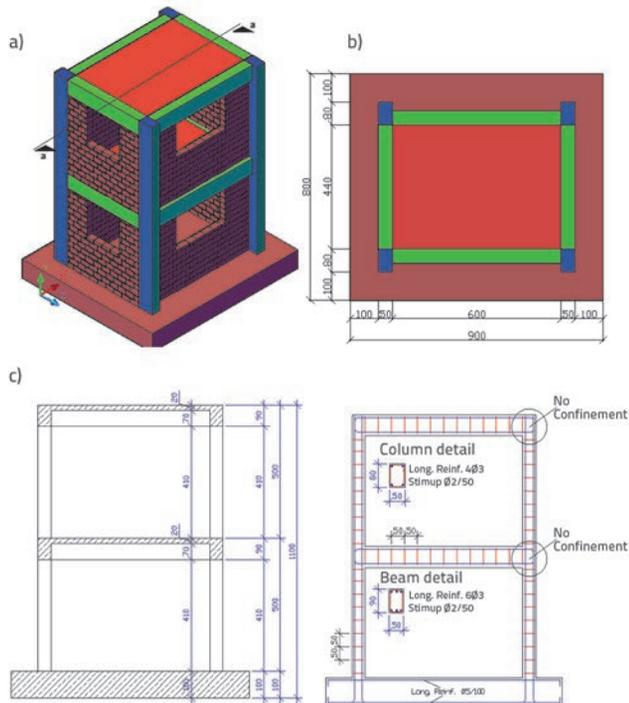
Dimensional and reinforcement details of general specimen (dimensions in mm)
